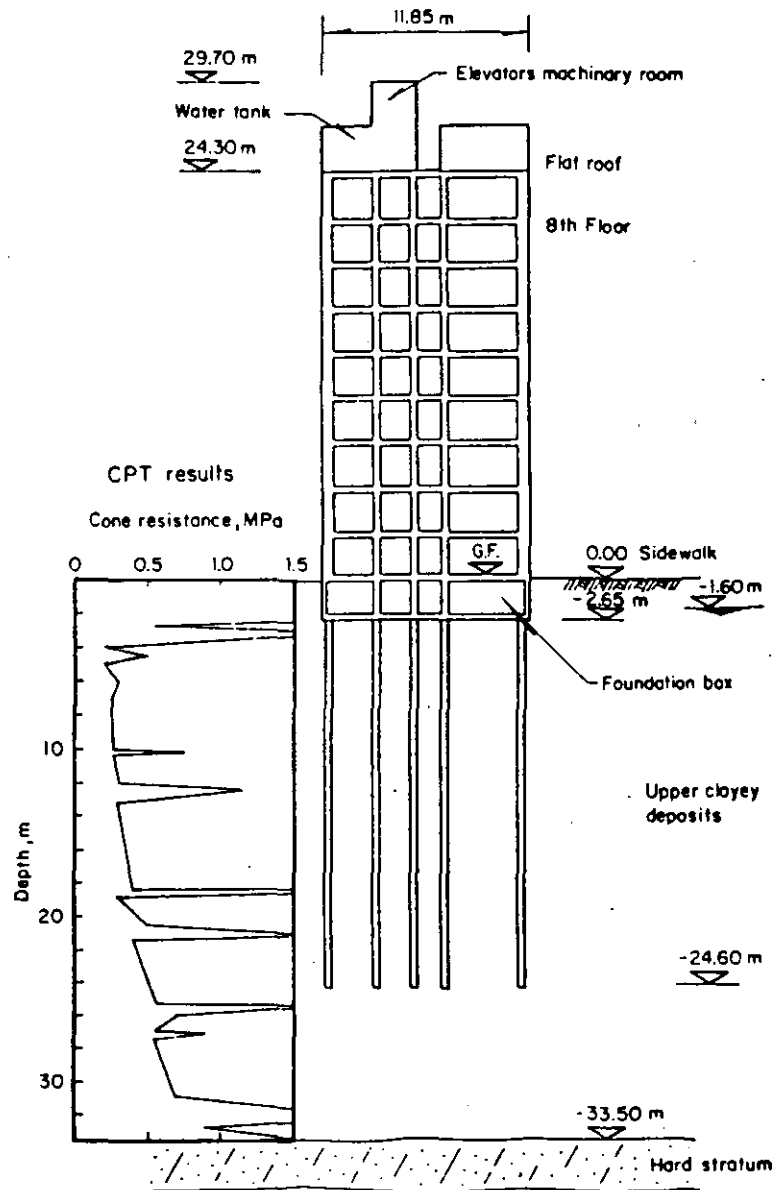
Elevation of the Building V including foundation and geotechnical conditions.
